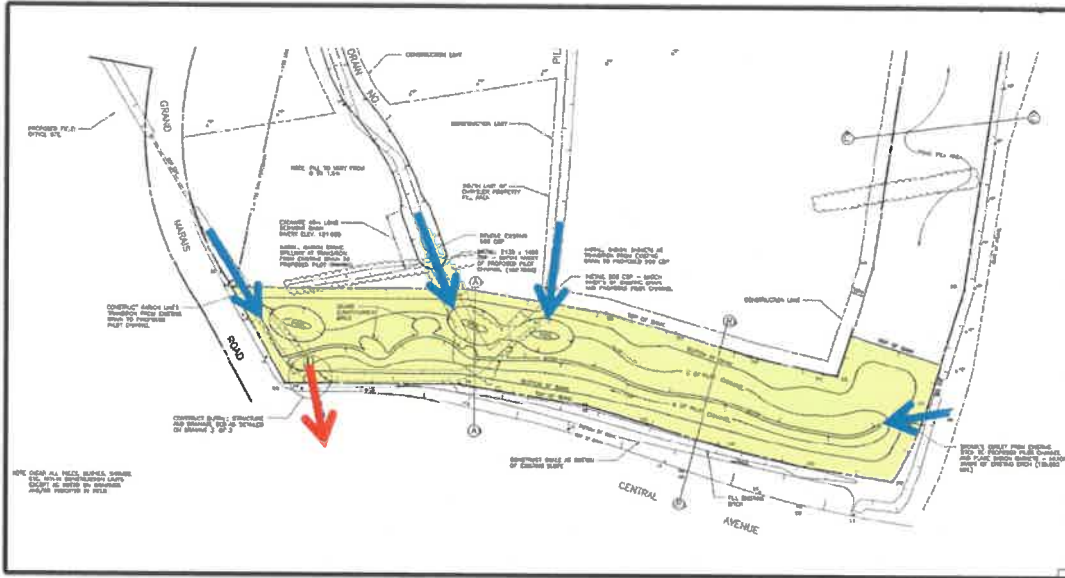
Central Avenue Pond – Pond Inlet and Outlet (red arrow) Locations
